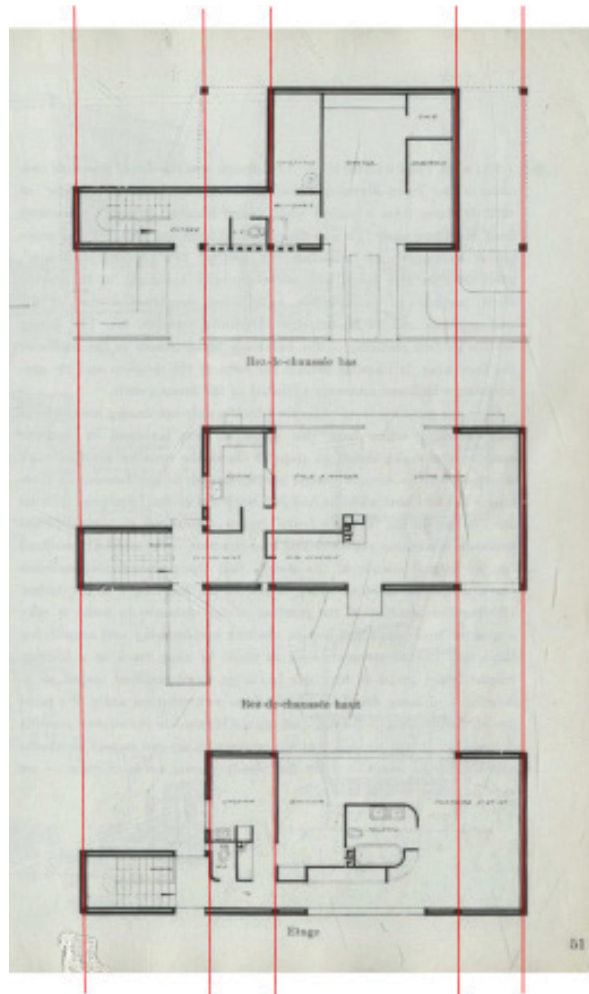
Le Corbusier and Pierre Jeanneret, Villa Besnus at Vaucresson, Floor plans as published in *Œuvre Complète de 1910-1929*, page 51. Red highlights by the author marking the structural column lines, with the columns embedded in the perimeter walls.
